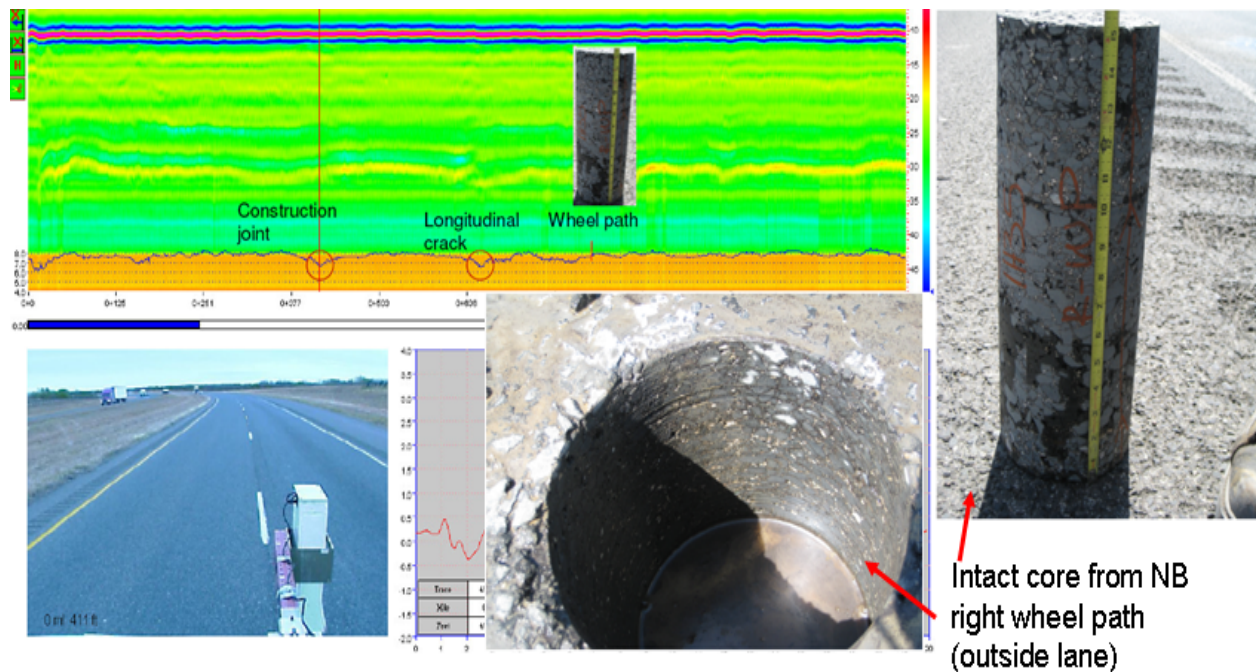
Coring along the Longitudinal Crack on IH 35 (Gilbert Job).
